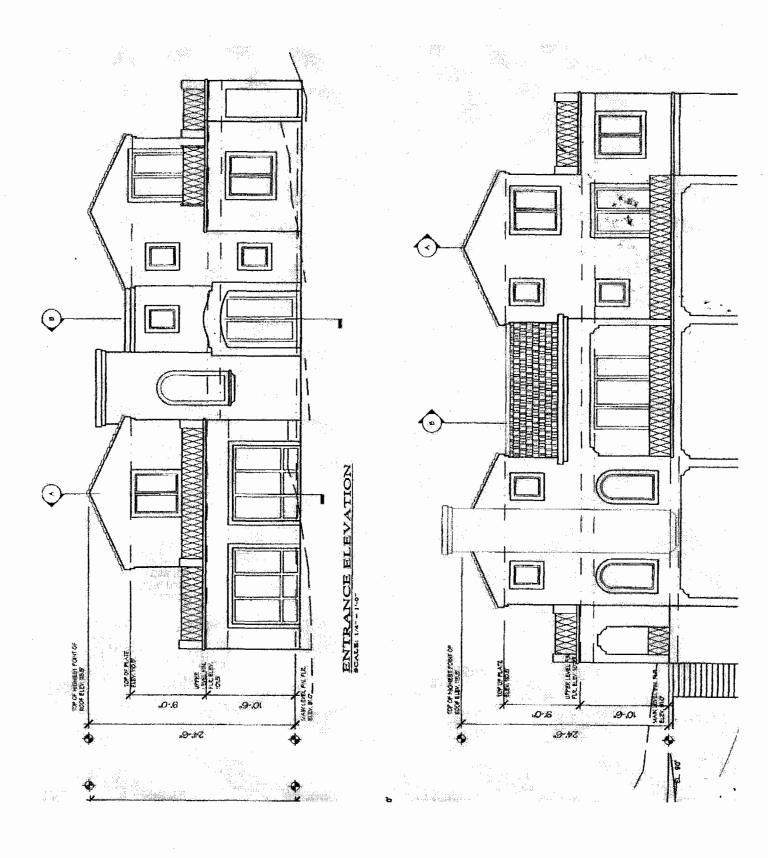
CDP No. 4-05-062 East and West Elevations
